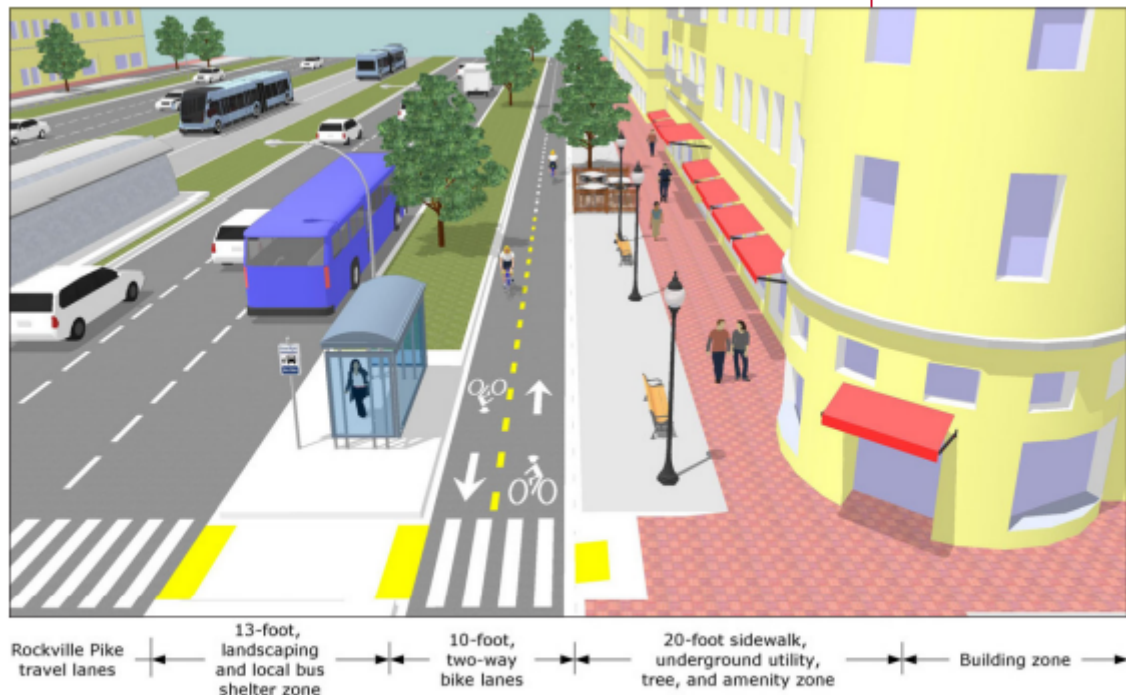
Alternative Pike Street Section (Rockville Champion Projects)
